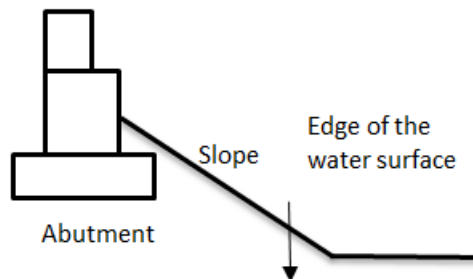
Slope between bridge abutment face and the edge of the roadway or channel
